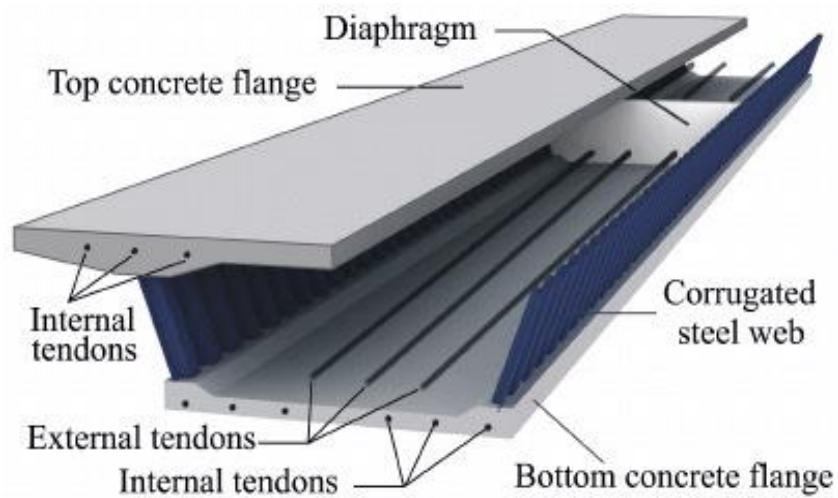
Terminologies (flange, web, diaphragm, rib, stiffener) we will be using for a typical box-girder bridge.
